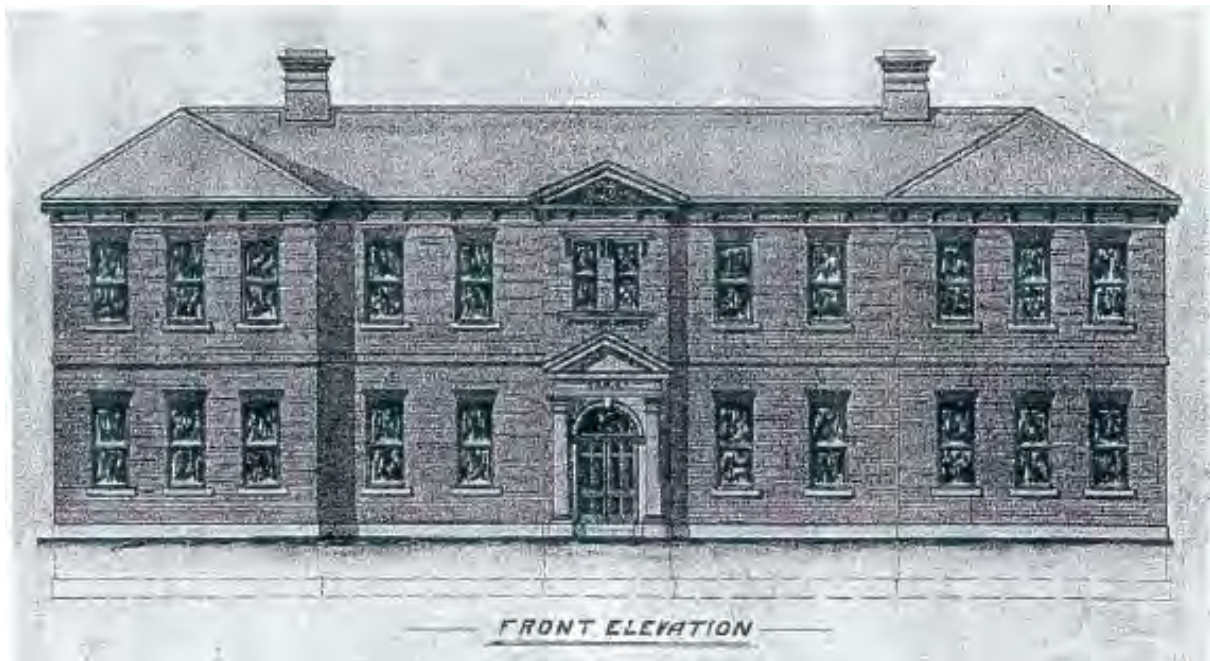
Plans of the original front elevation of the CME building, showing the building without balconies and verandah (Source: 1997)
